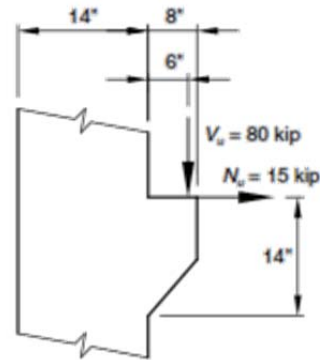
Typical loading on a column corbel from an inverted-tee beam or precast double-tee beam stem (1 in. = 25.4 mm, 1 kip = 4.448 kN)
